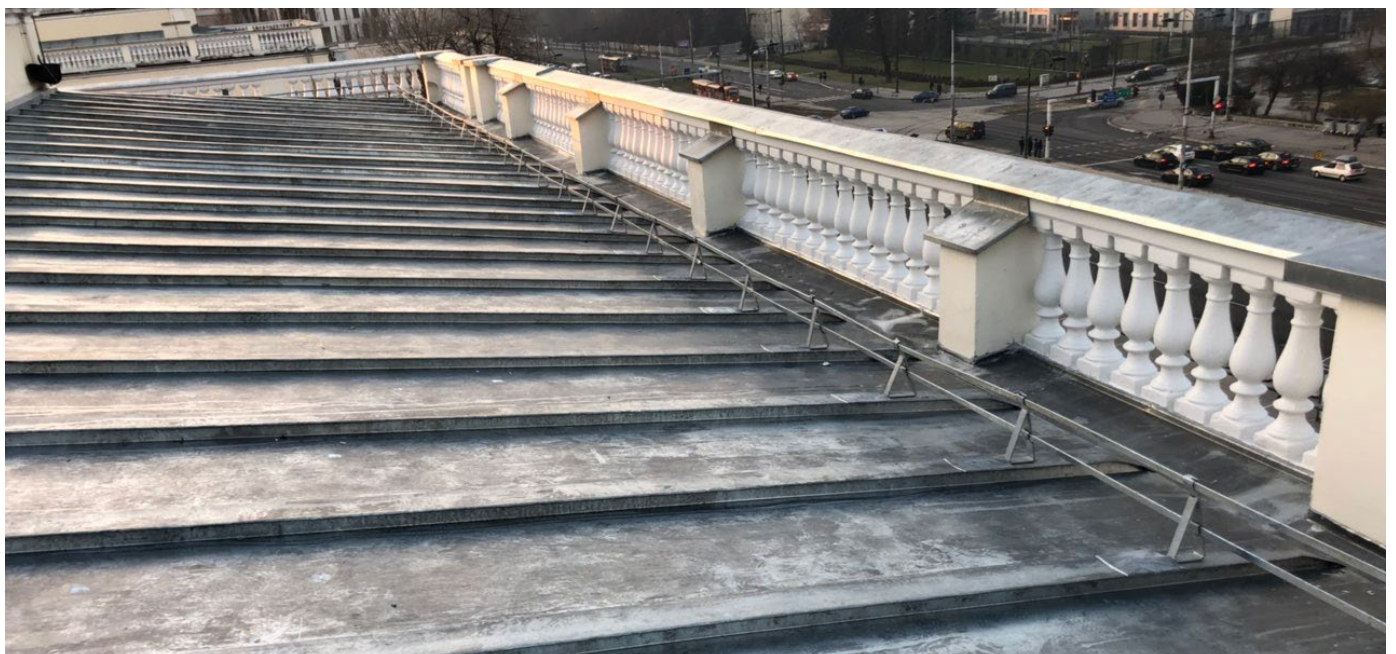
Restoration of the roofs above the Prehistory Section, Neimari. d.o.o. Sarajevo
